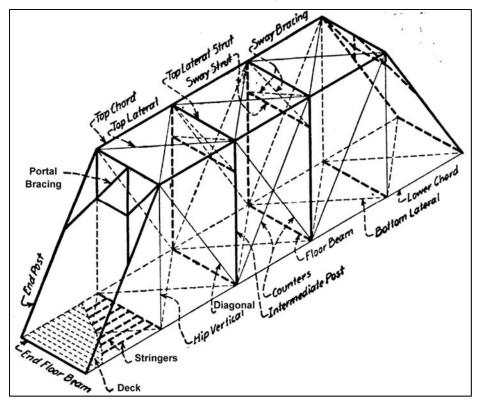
SKETCH OF A PRATT THROUGH-TRUSS BRIDGE, NOTING THE PARTS OF A TRUSS (HISTORIC BRIDGE FOUNDATION 2017)
